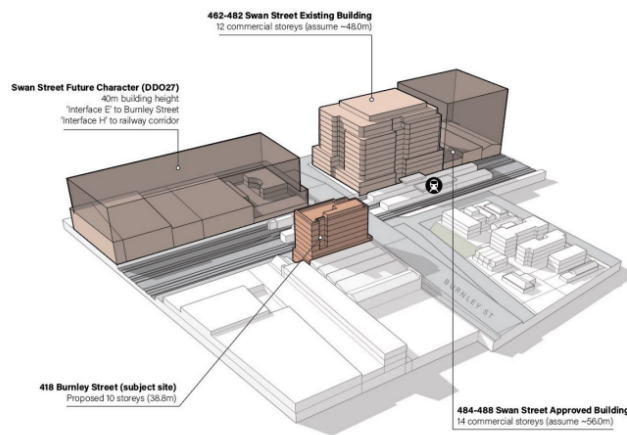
Proposed built form scale (pink) relative to existing approved and potential building scales within close proximity of the site (Source: Blades Studio, 5 August 2025)
